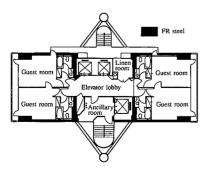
Typical floor plan of Hokke Club Ikenohata Hotel
